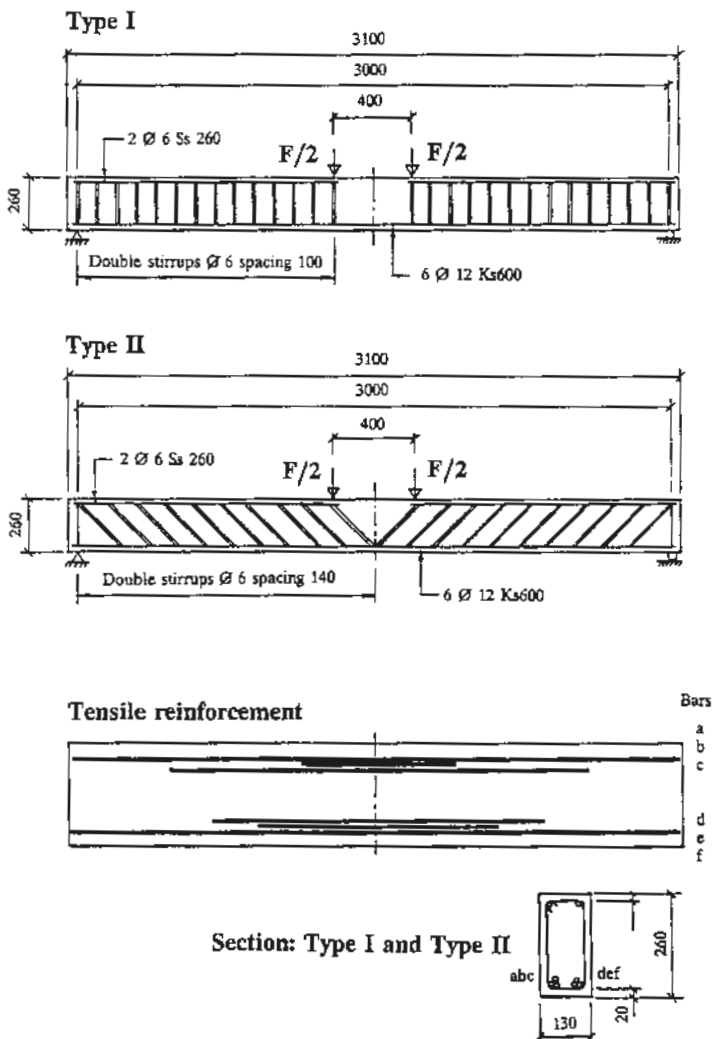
Design of the beams in Series A, beams A6 to A10.
